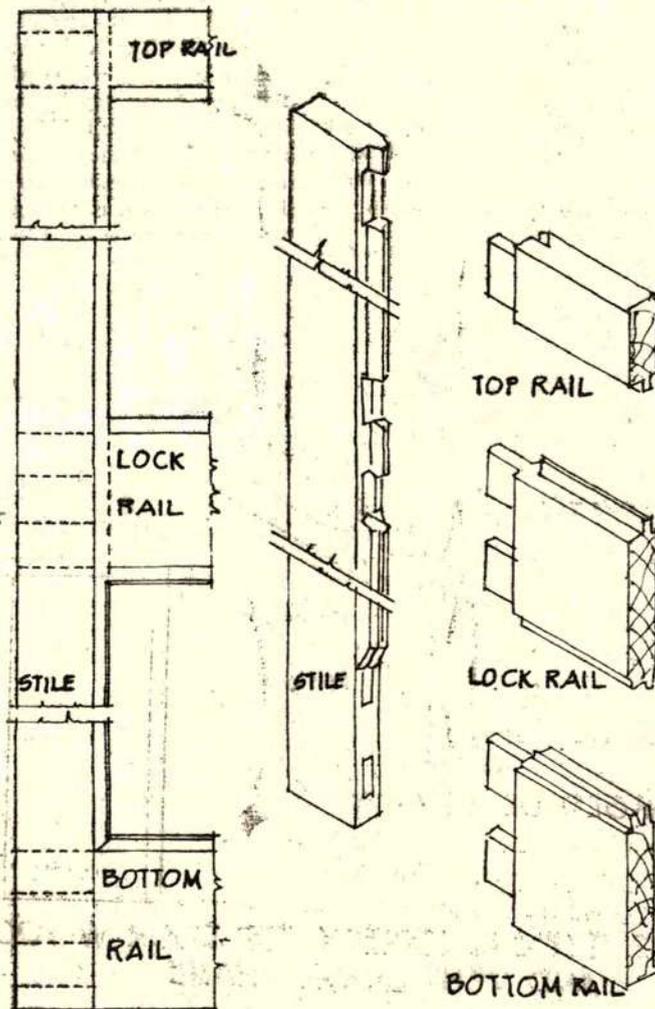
DETAILS OF TYPICAL JOINERY BETWEEN RAILS AND STILES
